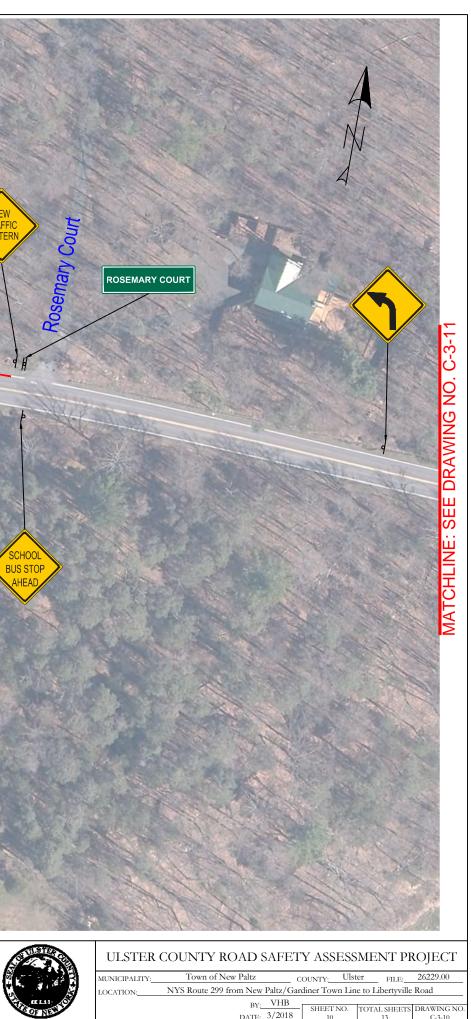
NEW PALTZ CONCEPTUAL IMPROVEMENT PLAN
